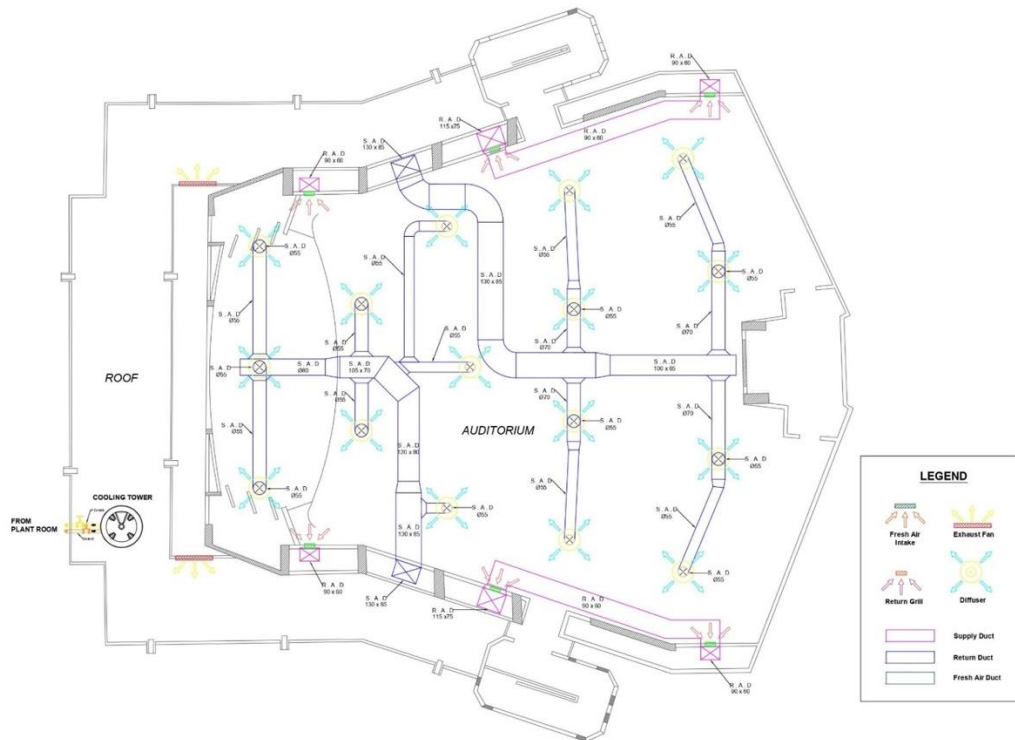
Figure XIX.- Duct & Pipe Layout for Proposed System # 1
